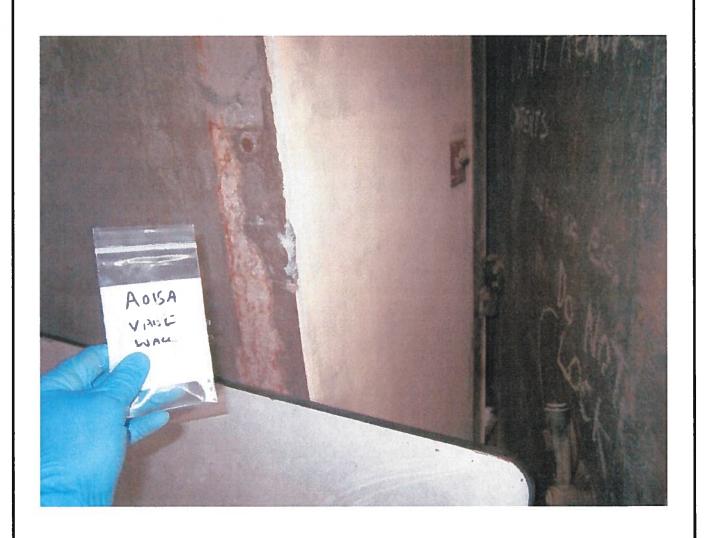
Non-ACM Vault Wall Coat Sample A-015A
